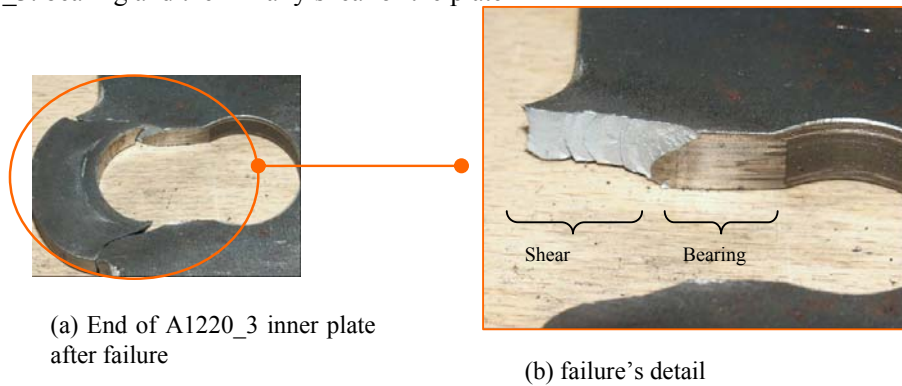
Bearing and shear deformations of the inner plate after failure (A1220_3).
